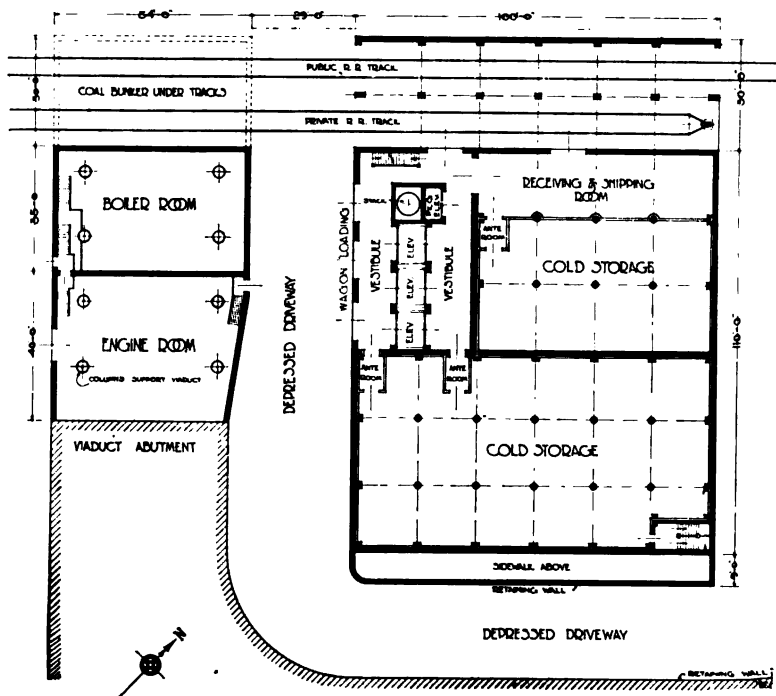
FIRST STORY FLOOR PLAN—COLD STORAGE BUILDING.
